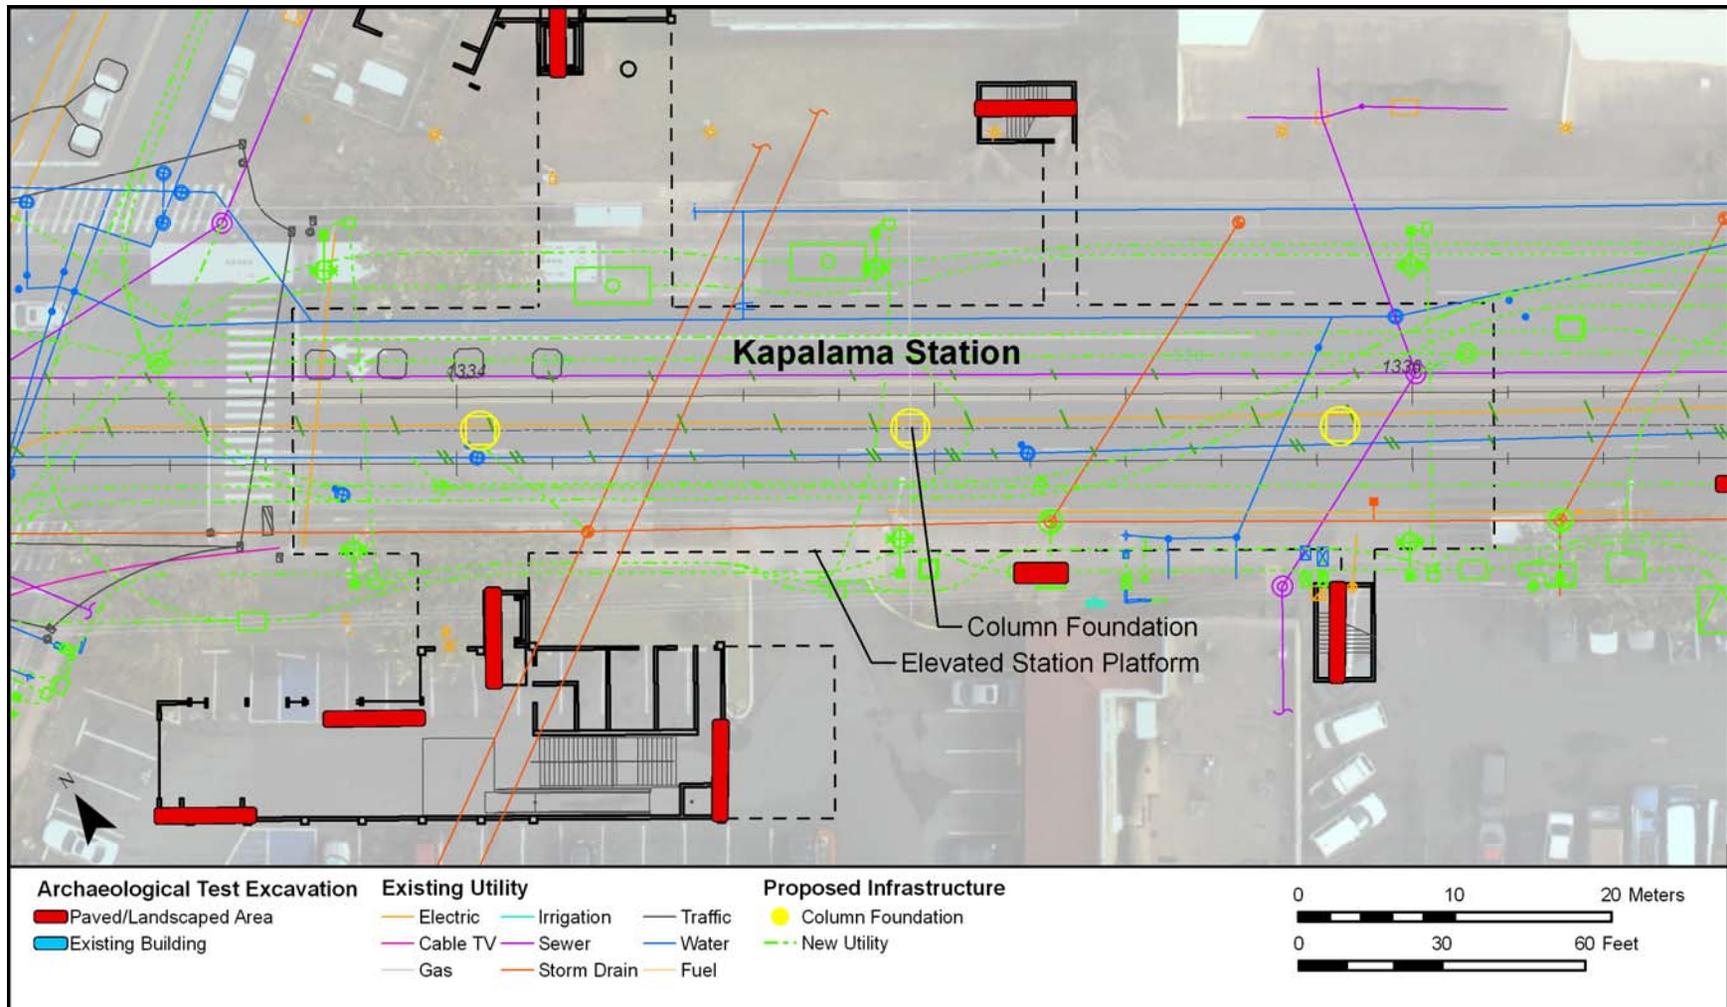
Kapālama Station, detail of column foundation layout at Dillingham Boulevard (no testing of three station foundations due to utility constraints; one off-set trench excavation of 3' by 10' at a future *makai* storm drain catch basin)
